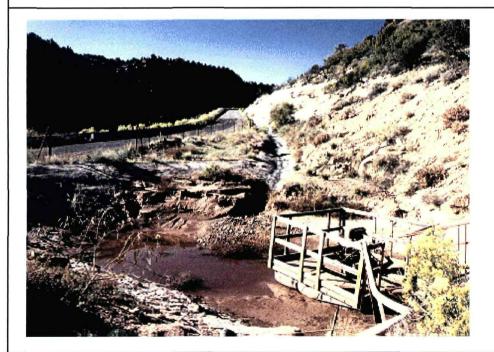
Hillside Collection System Along County Road EE-22, October 1999
